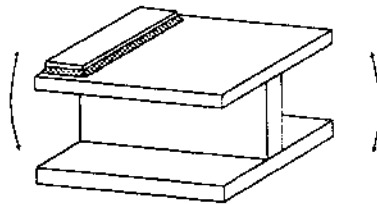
UKDEn Detail in Welded Girders 4
